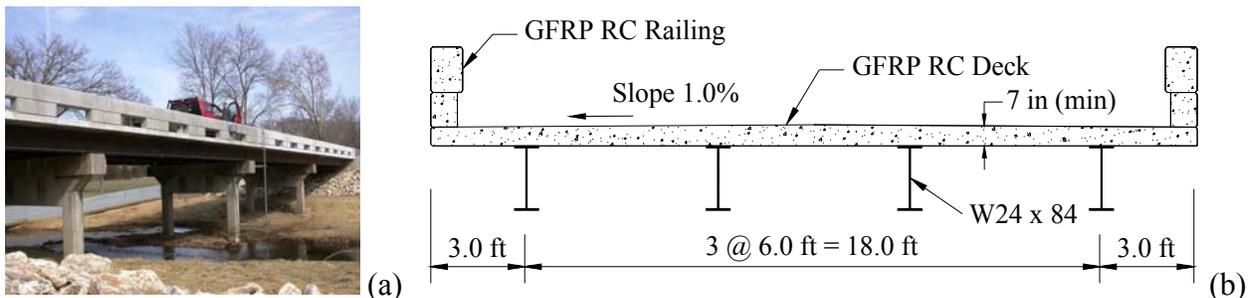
New Bridge 14802301: photograph (a) and schematic of cross section (b).
